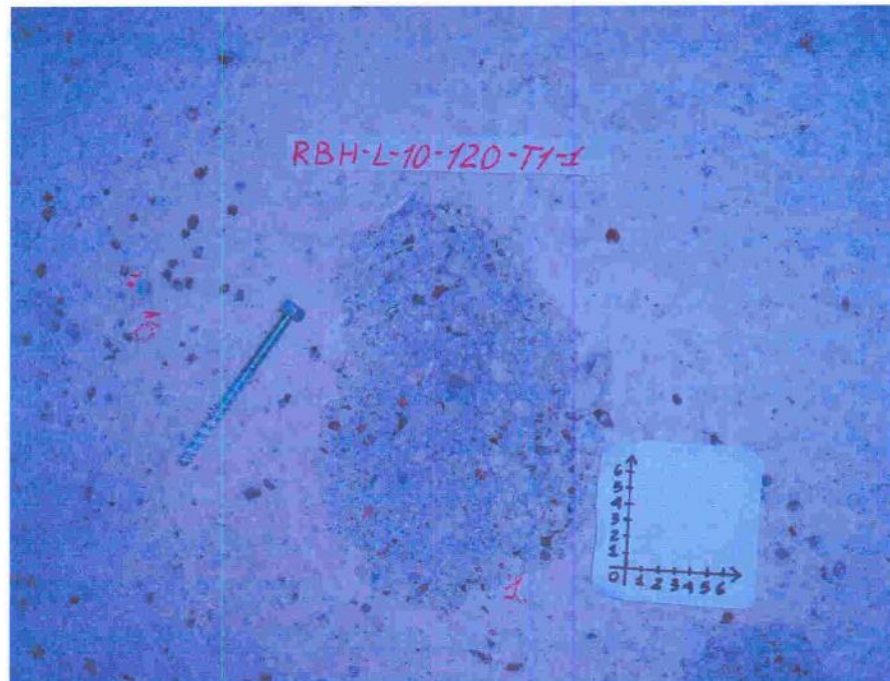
Tension tests M10-T1-1: concrete failure.
